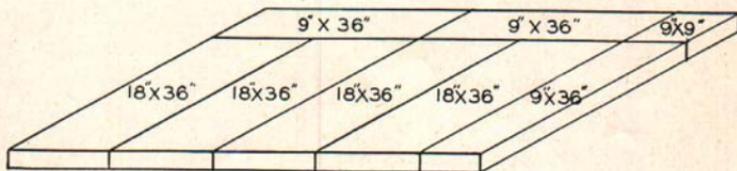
Method of arranging the insulation packages for the floor of a four-can tank.
